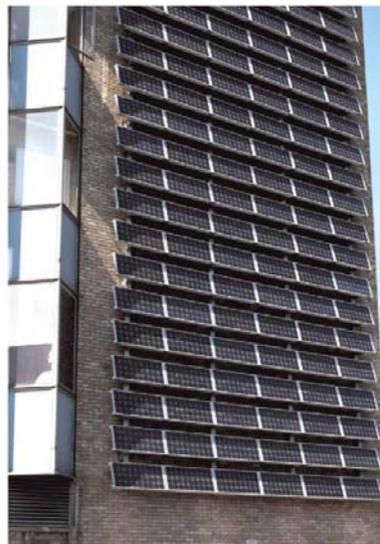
Bay windows casting shadows across the façade (Clarke et al., 2008)
